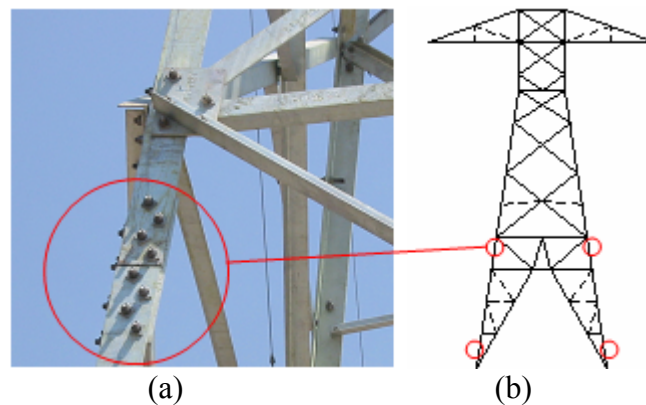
(a) Main bar splice detailing of tower “2” and (b) Splice localization on the tower.
